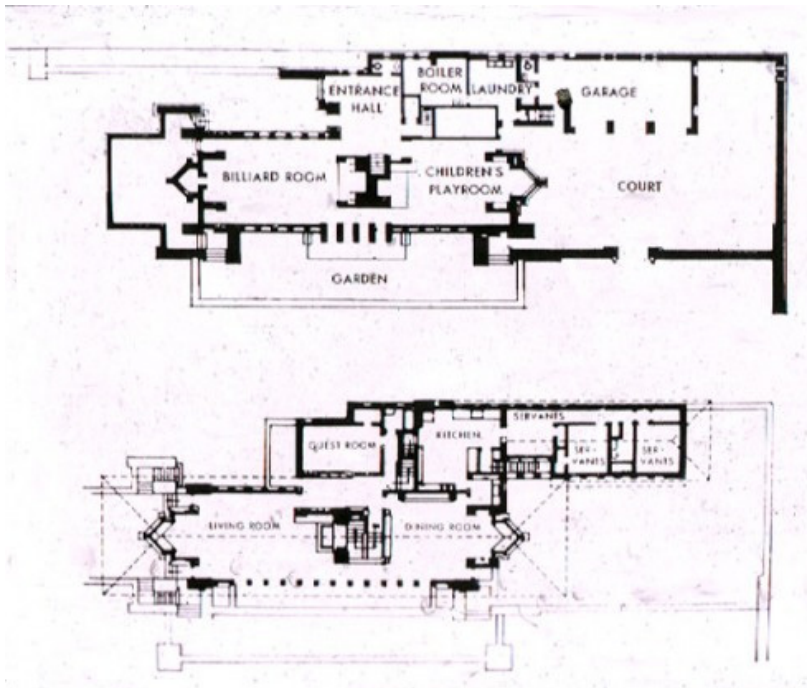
F. L. Wright- Robie House, Chicago - plans
